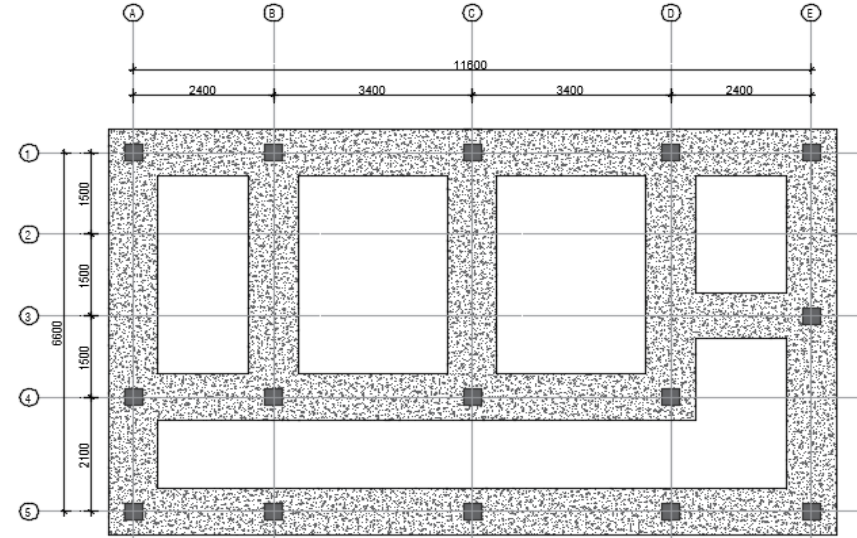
View of confinement cages at Ground level with reinforcement bars for Tie Columns
